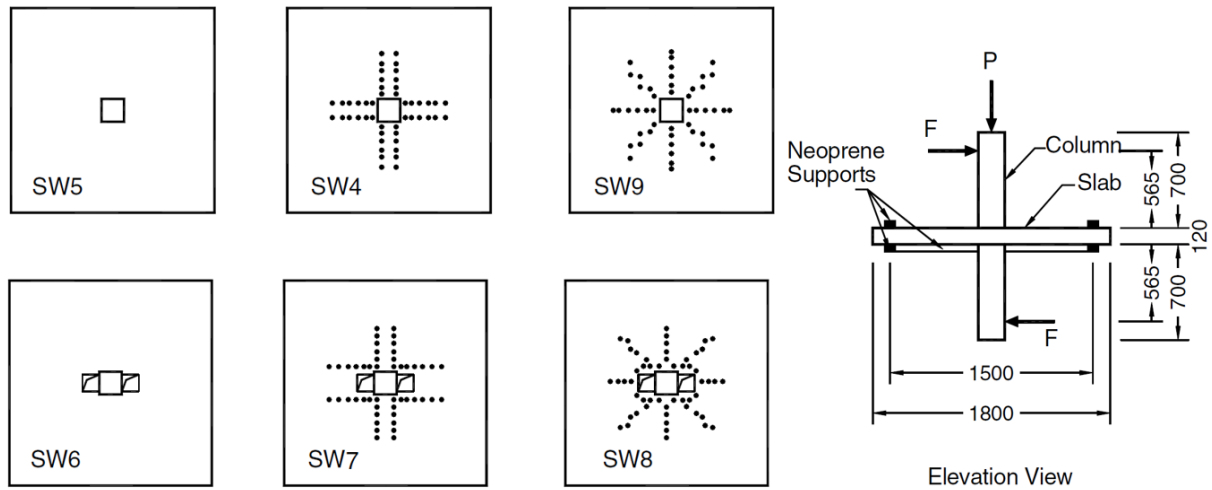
Plan and elevation views of the specimens, adapted from Bu and Polak [53].
